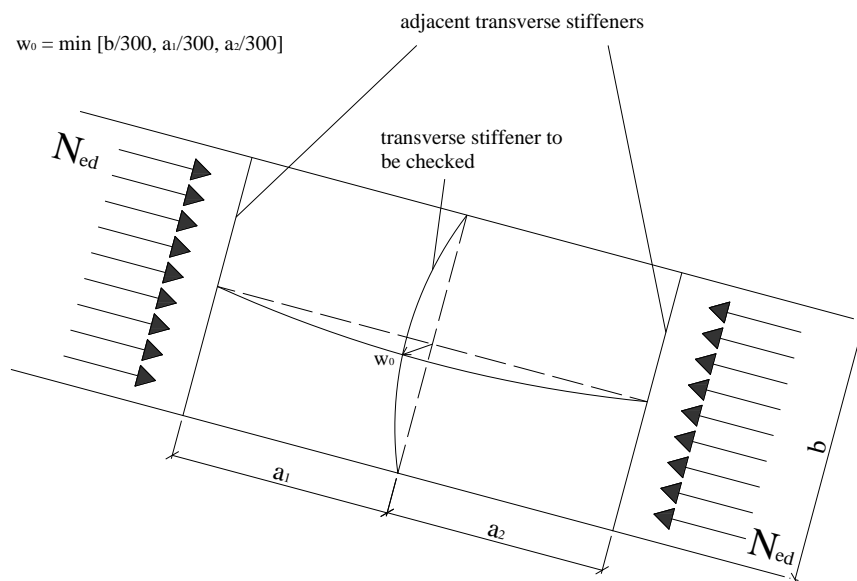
Scheme for rigid transverse stiffeners (Beg et al., 2010; Johansson et al., 2007)
